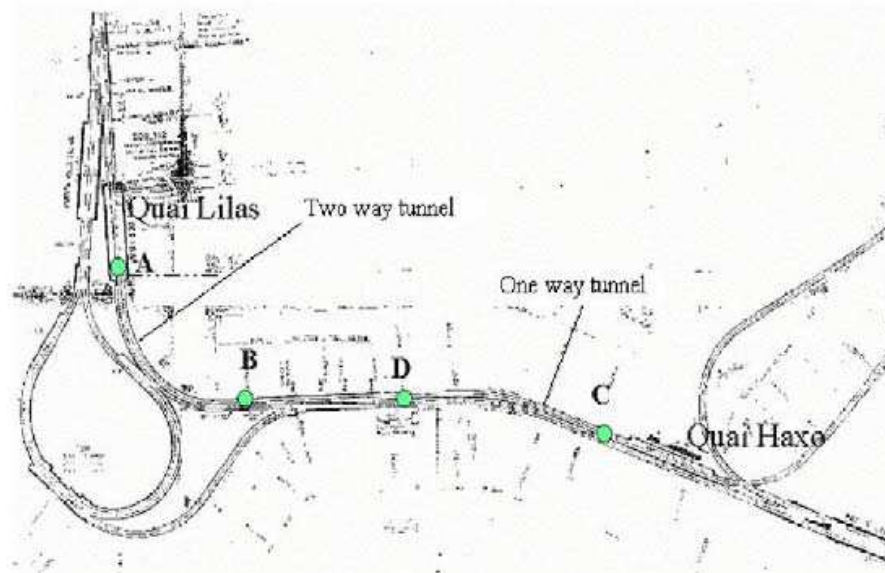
Plan view of the tunnel. The distance between Quai Lilas and Quai Haxo is 600 m.
